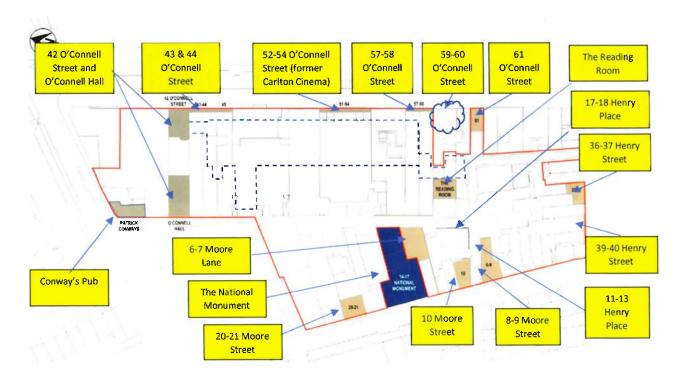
Protected Structures and non-protected structures proposed to be retained.
